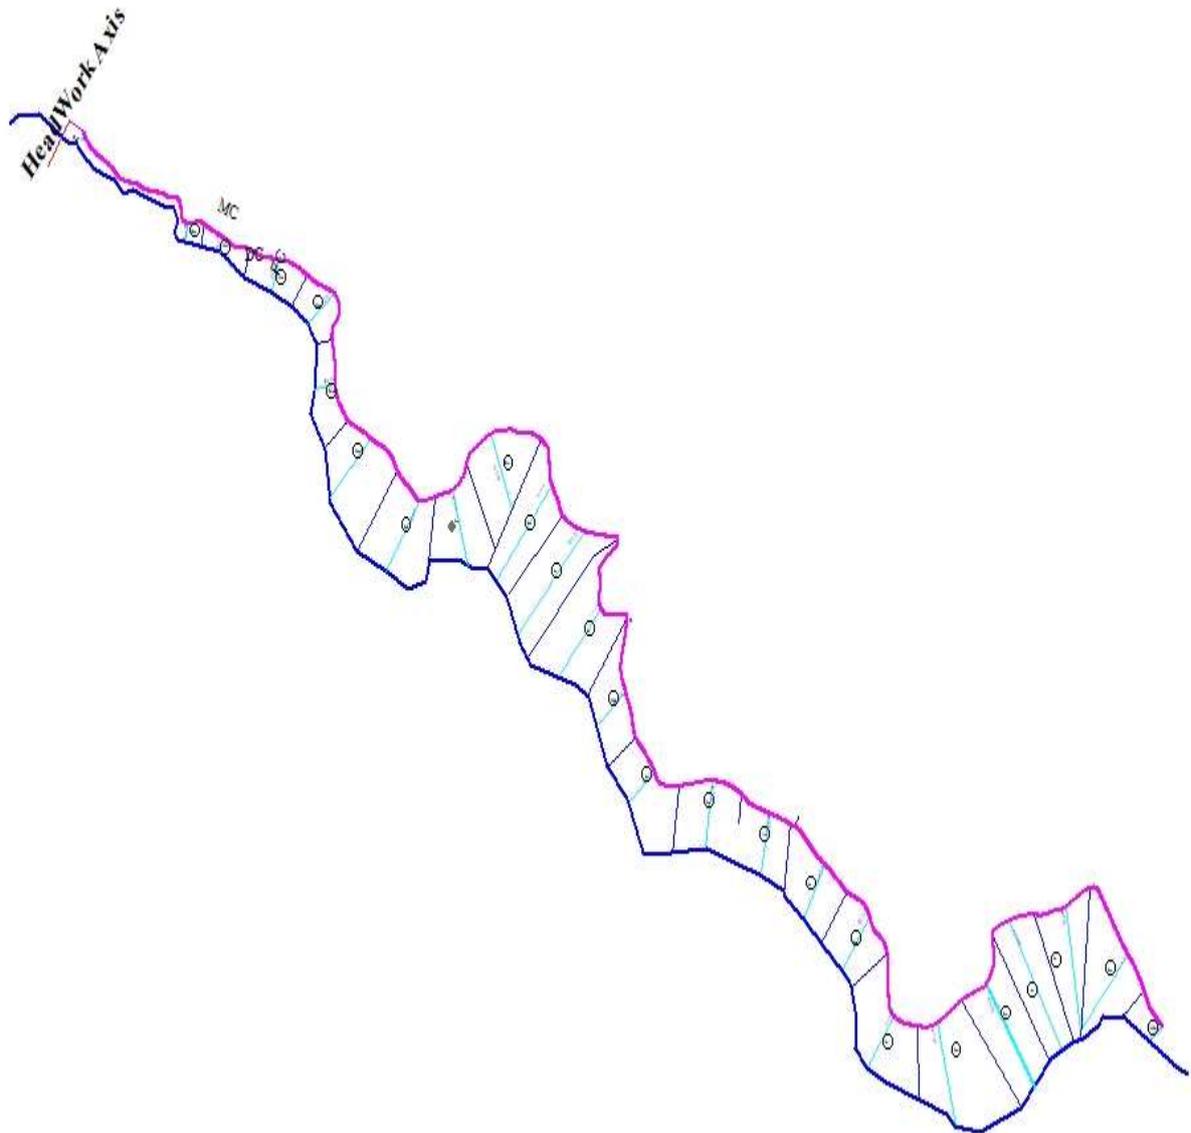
Schematic Drawing of Madagura Erbe Layout
